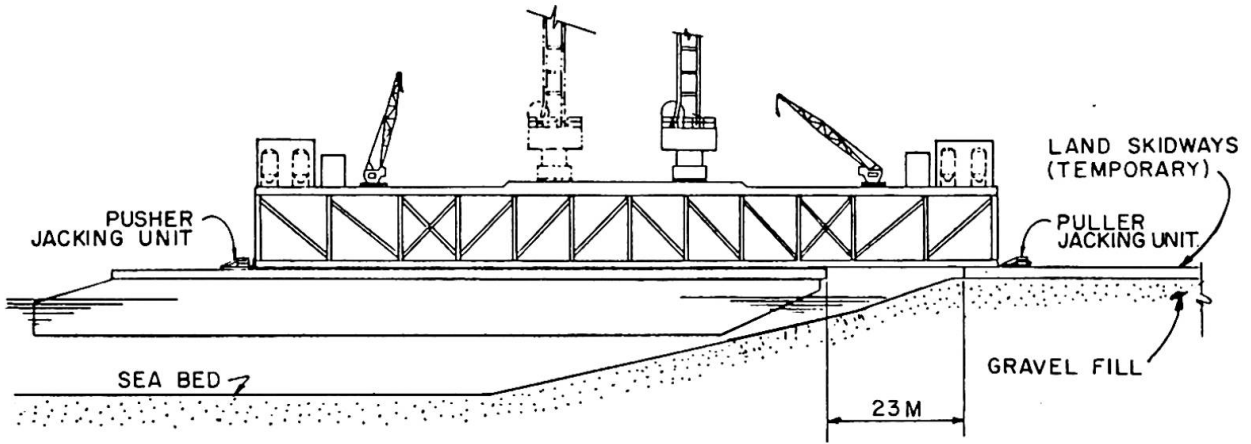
TRANSFERRING I-DECK TO ISLAND
